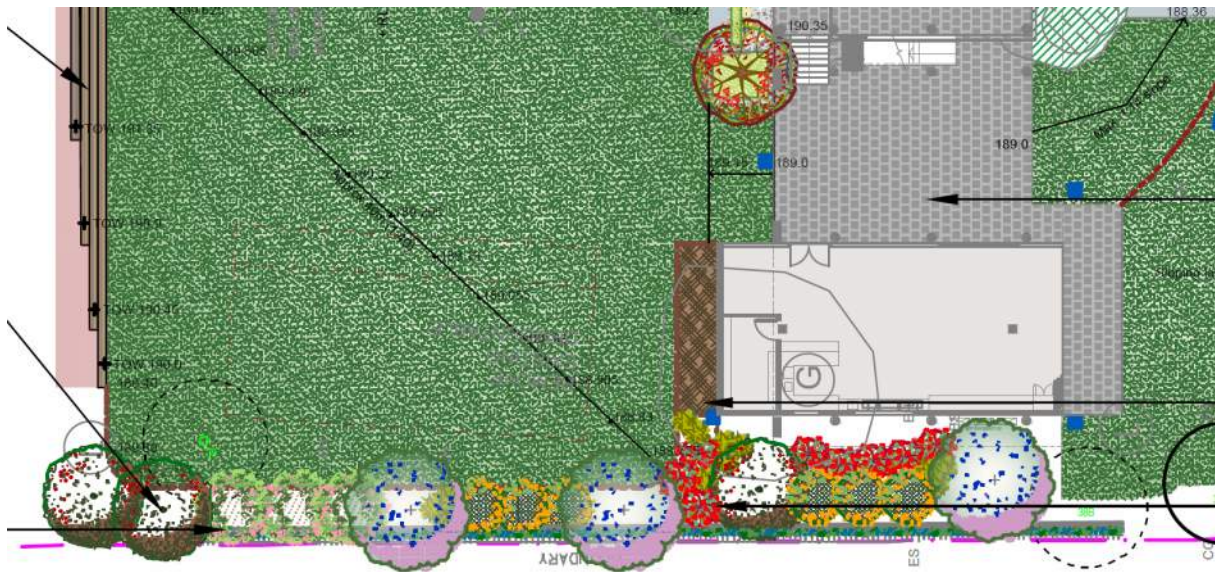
Proposed landscaping on the western elevation (Source: Concept Landscape Architects)
